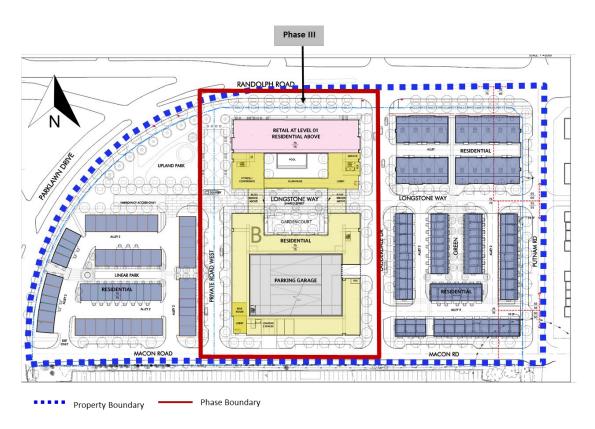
Approved Sketch Plan – Full Buildout in Phase III
